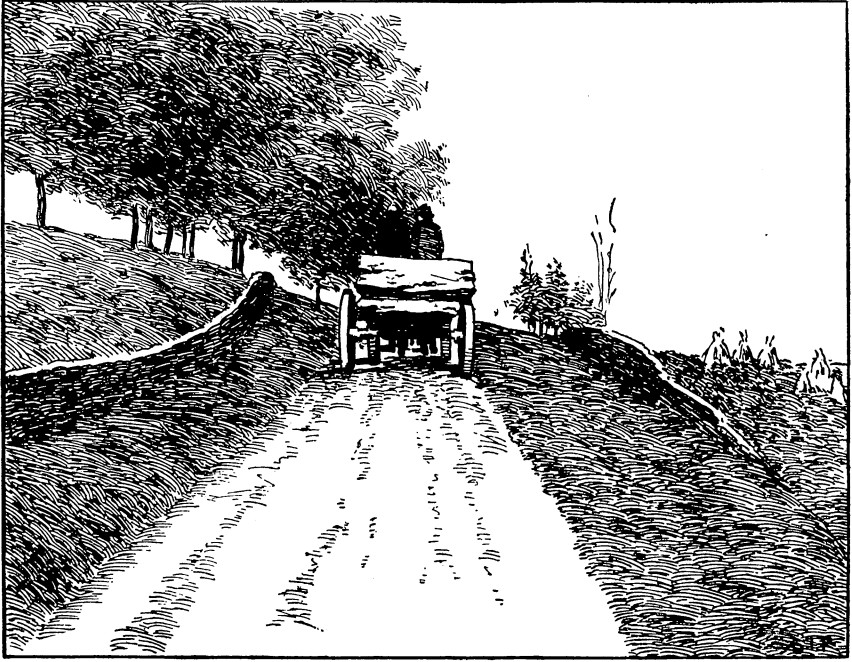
Road surface under weight of heavy block of stone supported on wide tires.
